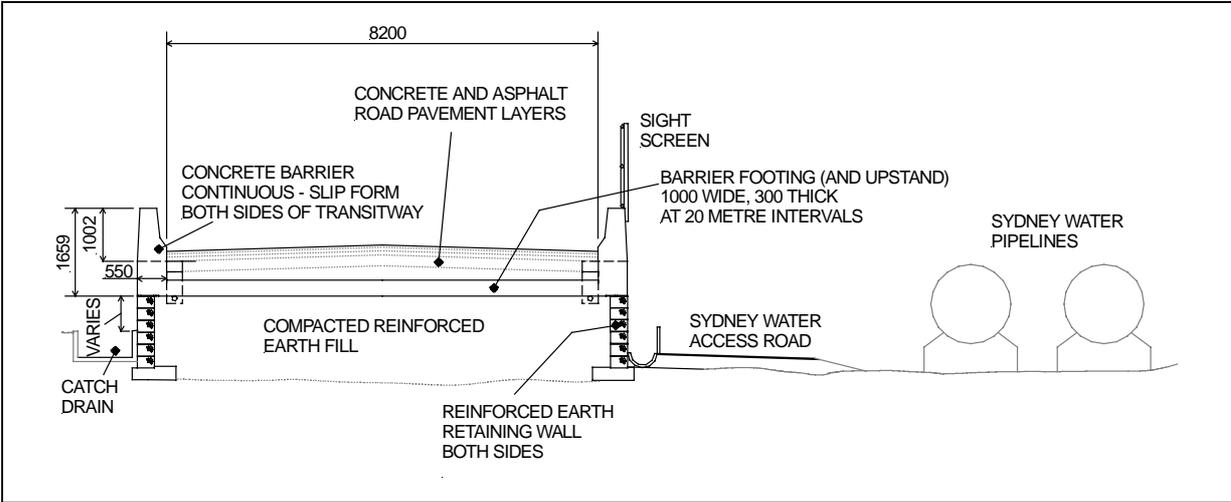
Cross Section at Footing, Liverpool Parramatta Bus Transitway
